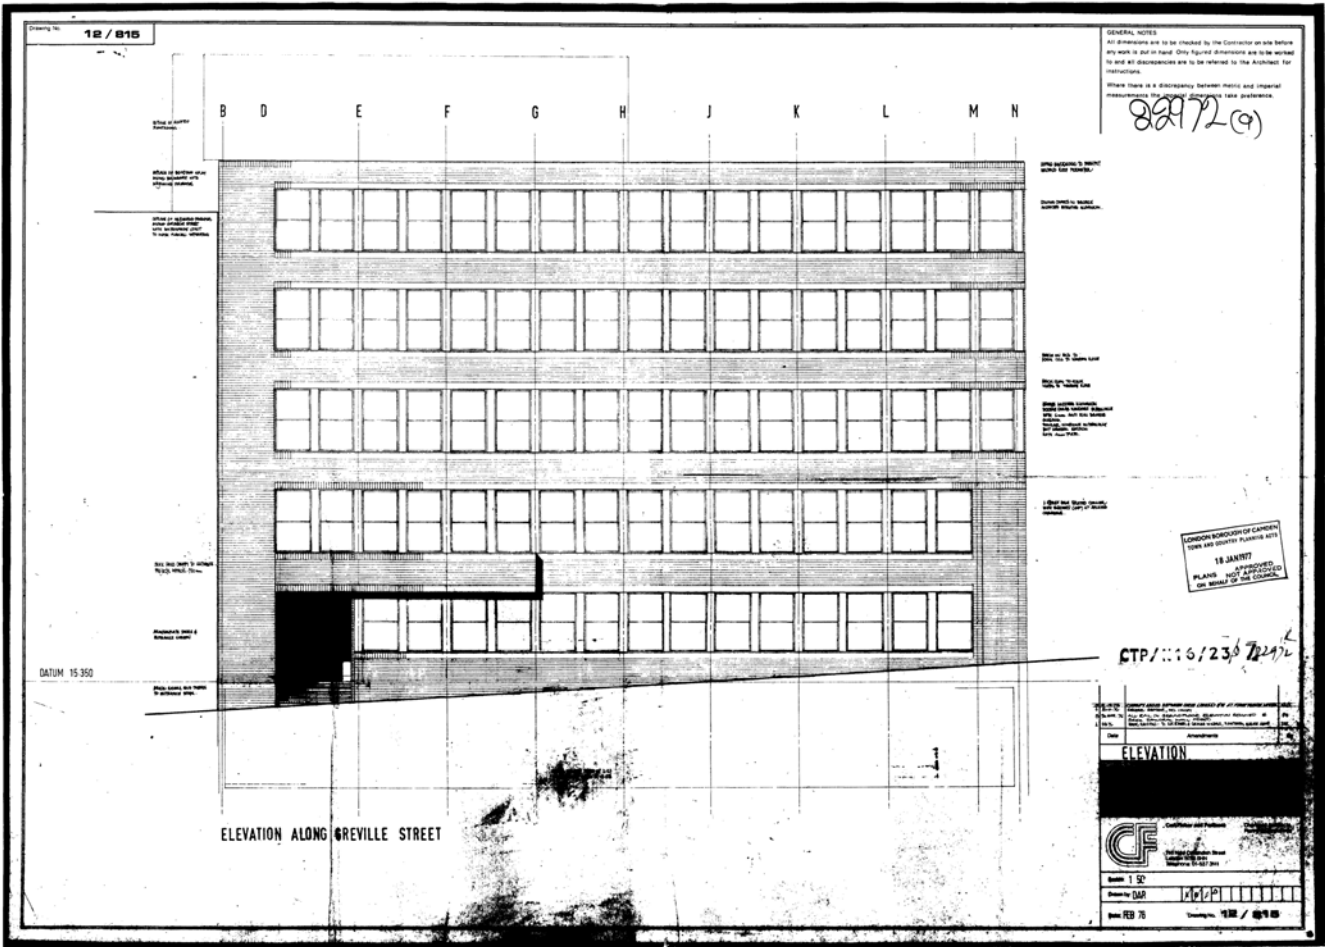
Carl Fisher and Partners, North Elevation, 1976.
